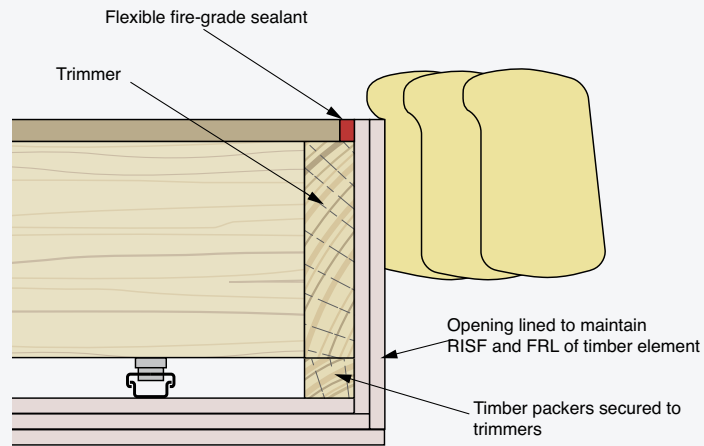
Typical riser penetration detail through a fire-protected timber floor.
